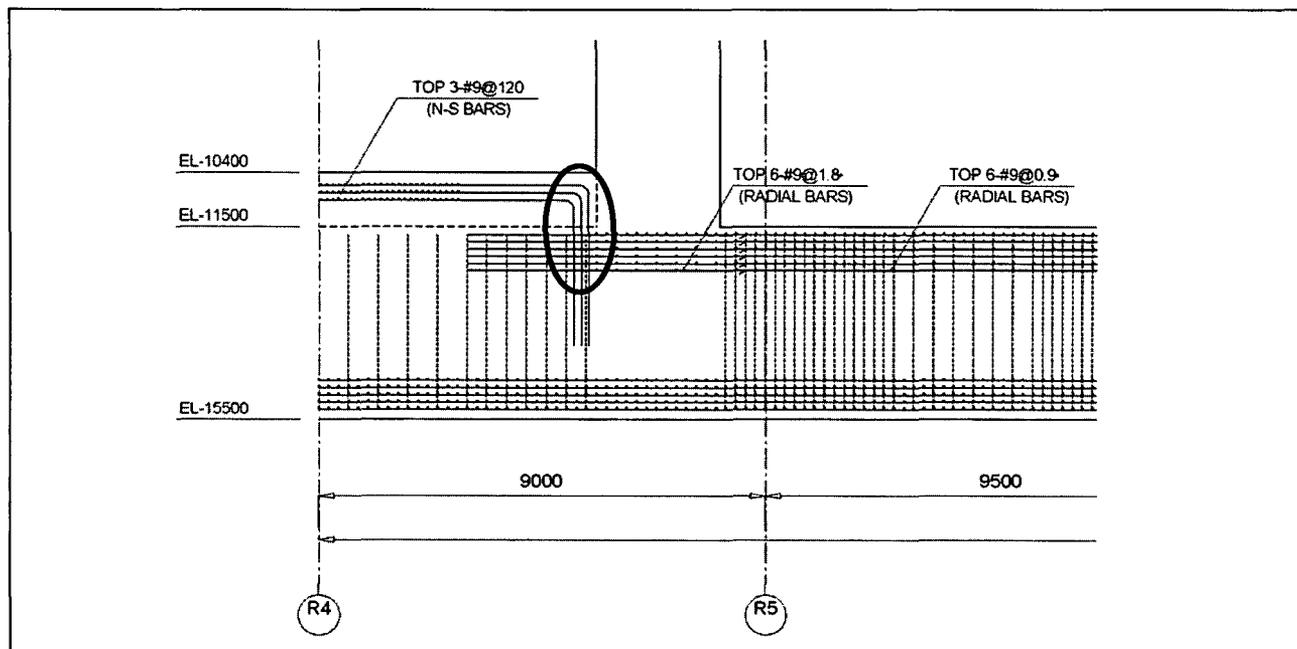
(2) Section of Basemat (Rebars at RCCV Center Are Raised)
